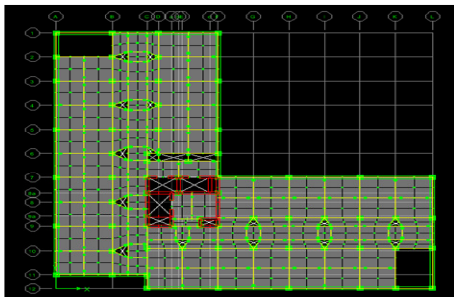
With Shear Wall Structure (Provision of Shear Wall is Indicated by Red Color)
